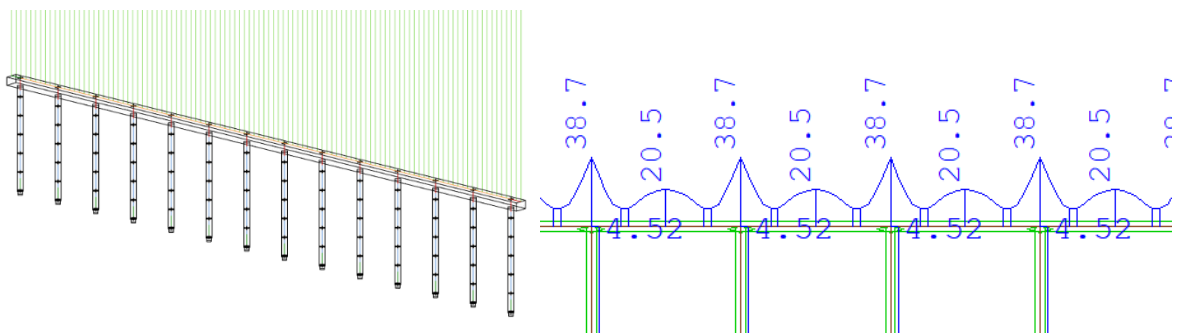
Area of reinforcement,  $\text{cm}^2$ . Load applied directly to strip foundation and wall part is not modelled.
